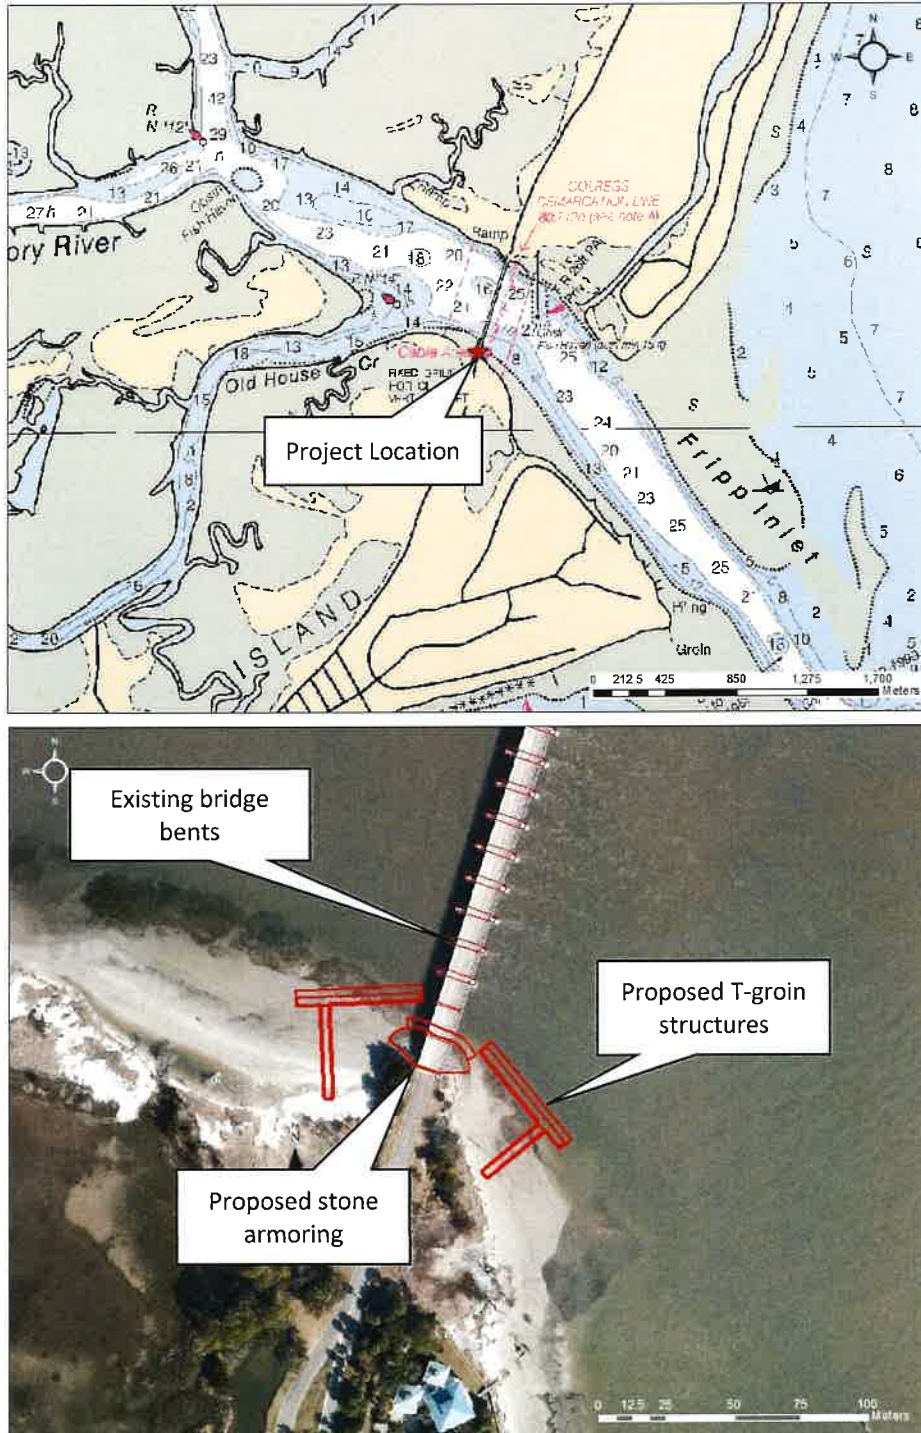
Overview (Upper Panel) and Site View (Lower Panel) of Fripp Inlet Project location. Upper Panel shows a NOAA nautical chart - #11517 (depths in feet, MLLW) and Lower Panel shows proposed T-groin and bridge abutment stone armoring layout.
